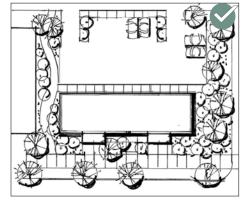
Locate a surface parking area to the interior of a site, away from the public realm.
